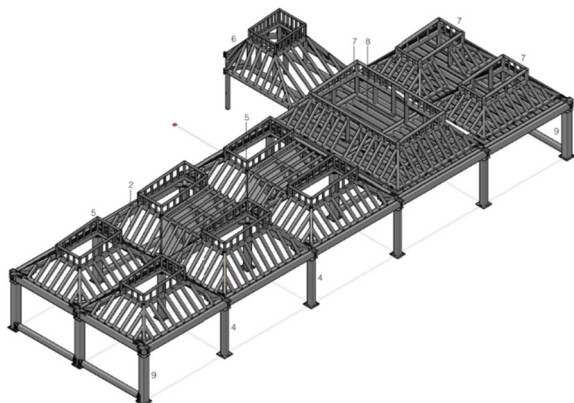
3D model of the oak-framed rooftop extension to The Department Store, Brixton.
